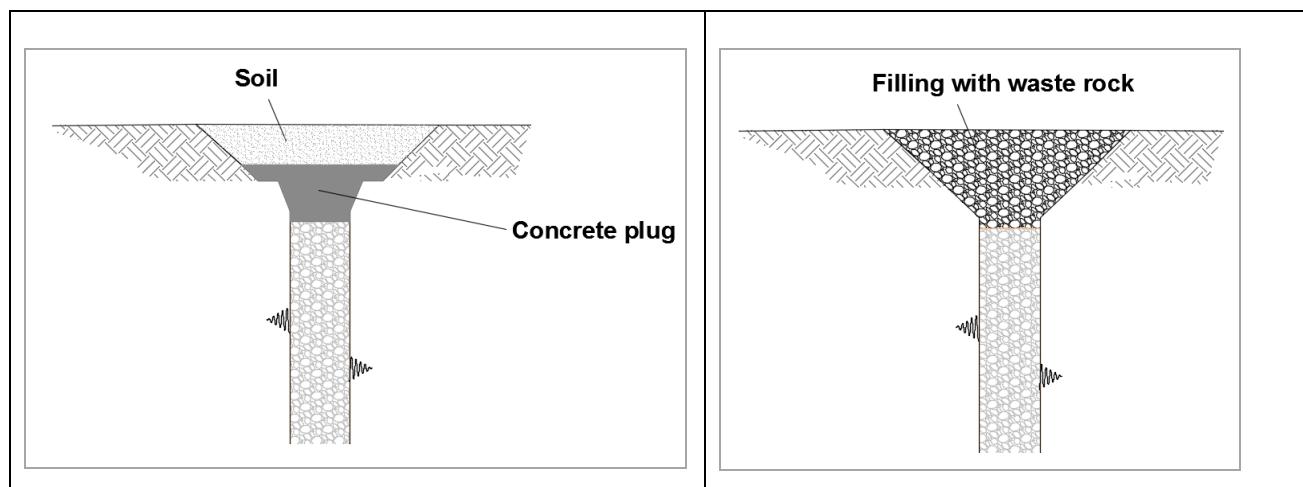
Sinkhole sealing with concrete plug close to the surface (left); filling with waste rock (right)
